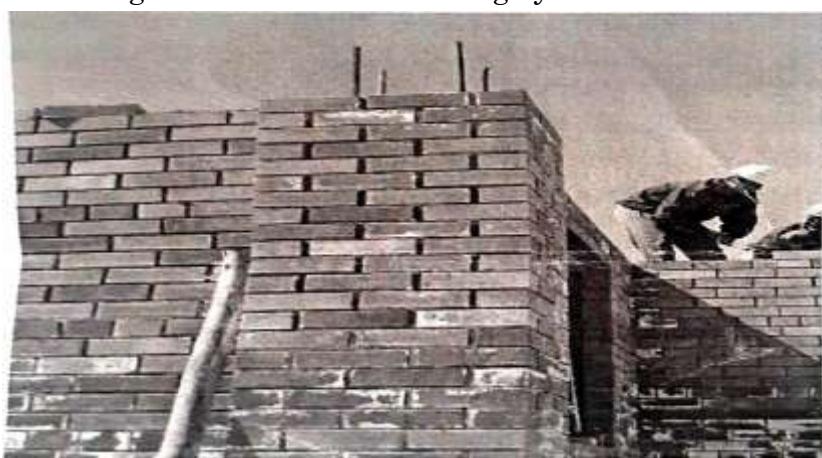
Exterior wall corner with monolithic reinforced concrete columns made of brick in a residential building (Navoi city).
